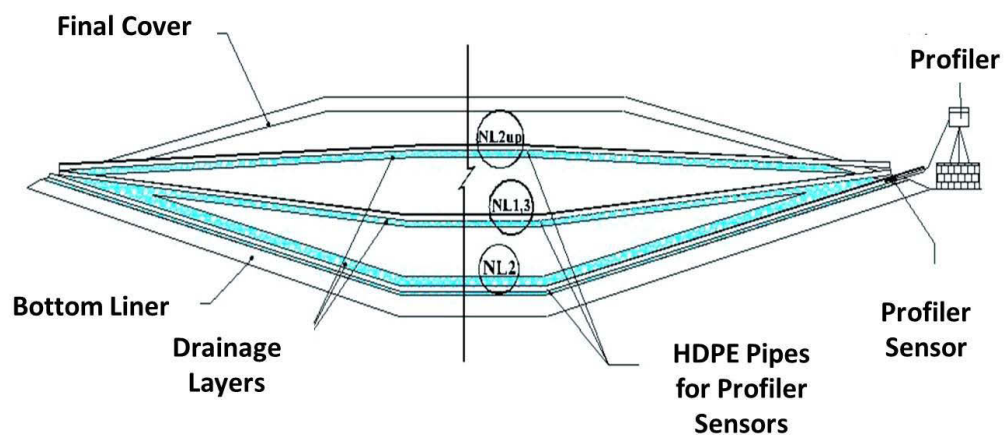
Section of Tehran Pilot Scale Landfill Illustrating the Position of HDPE Pipes for Profilers
